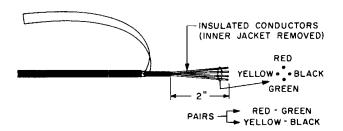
B Service Wire With Inner and Outer Jackets Removed
